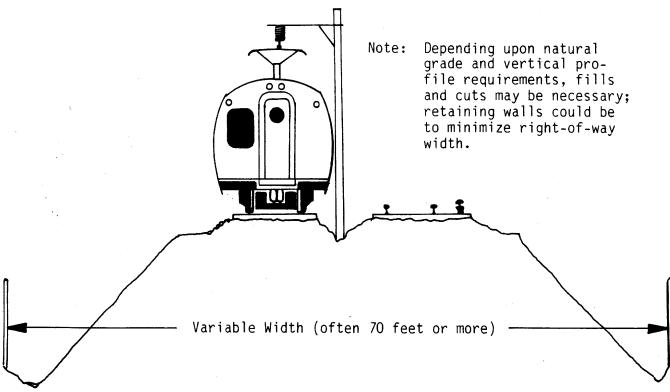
Cross Section of Heavy Rail Transit in a Fill Section
